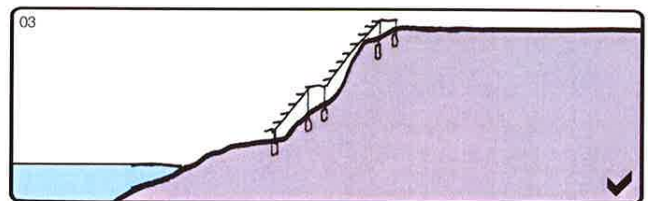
(j): New access stairways should have minimal disruption to the landform. They should be lightweight and constructed from steel or timber.(l)
